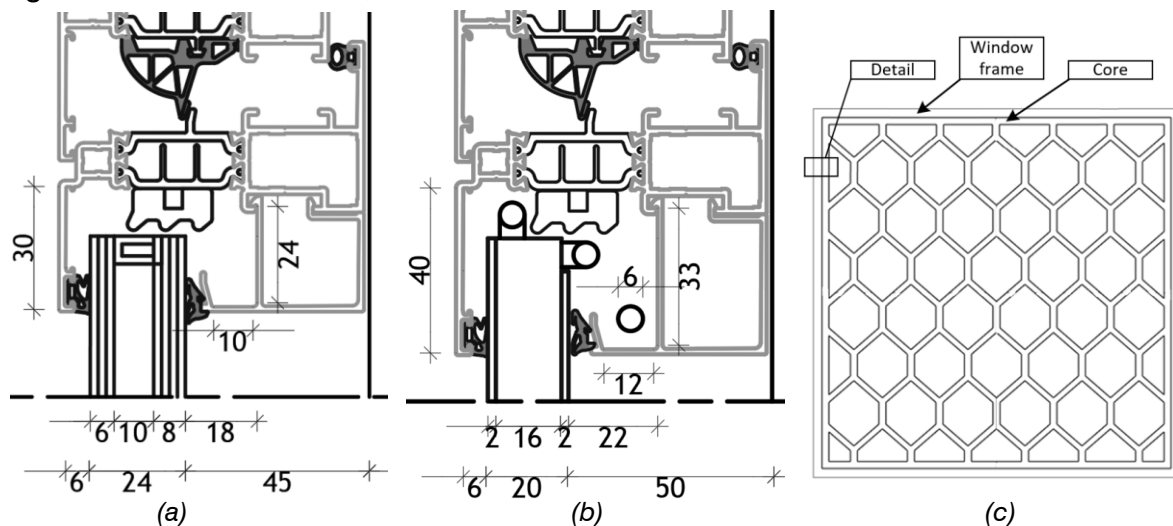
Horizontal window detail of (a) double-glass window panel; (b) thin glass panel with possible locations for 6 mm tubing; (c) location detail
